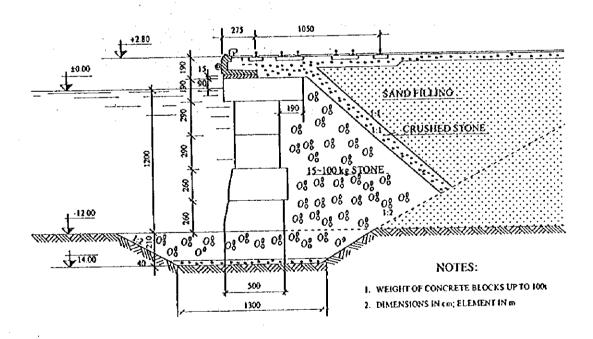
Standard Cross Section of Quay Block Type (-12.0m)
